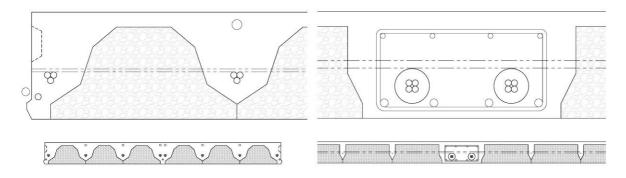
+10: Transversal section in SL-deck + Longitudinal section in SL-deck with beam.
